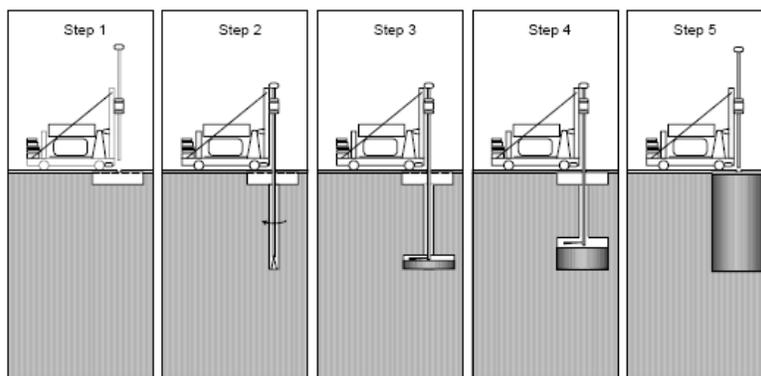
Step-by-step construction of soil cements columns by means of jet grouting technique.
